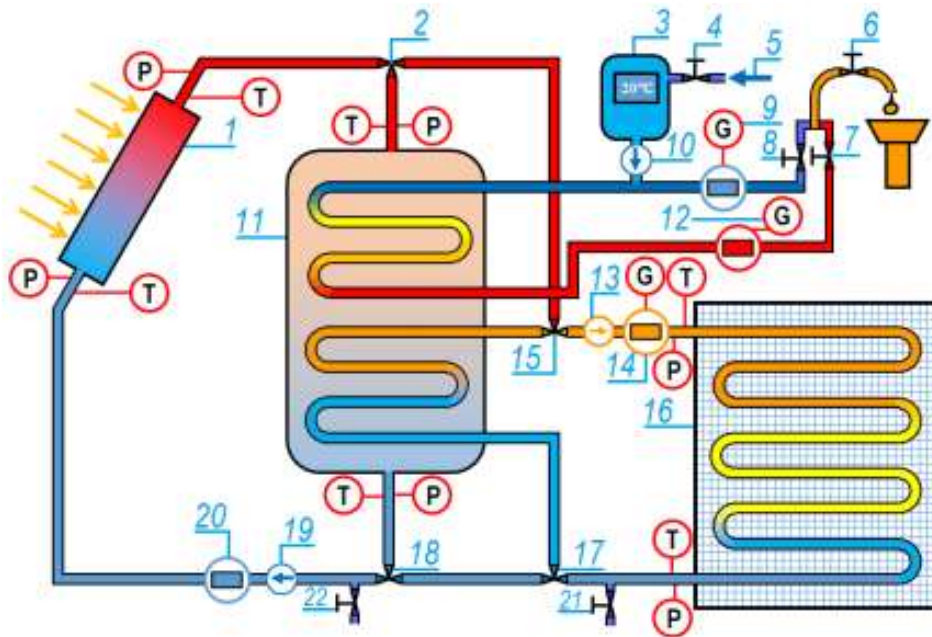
An overview of the experiment solar house and water heated floor system.
